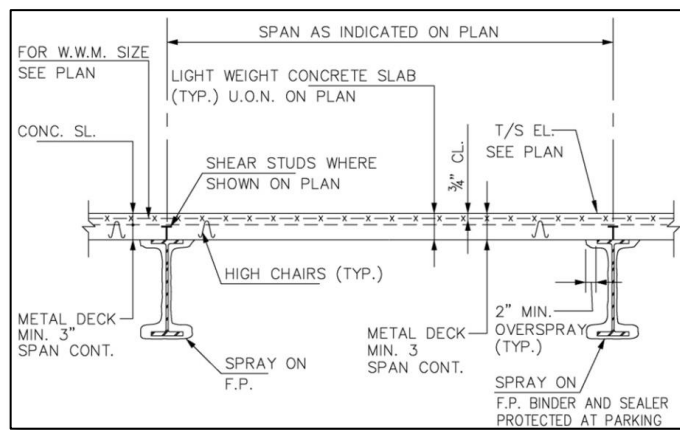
Typical Floor Construction, Metal Deck Perpendicular to Floor Beams on Girders
